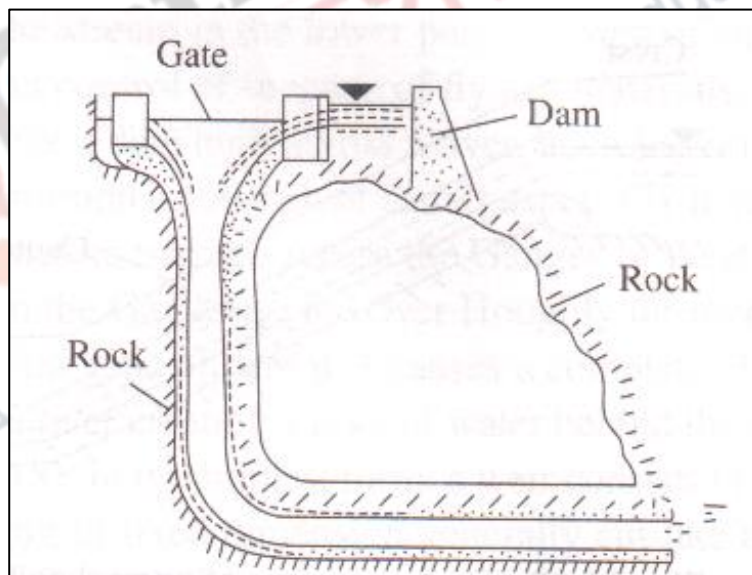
Glory hole spillway transferring water downstream well below the dam body (Gangopadhyay, 2013).
